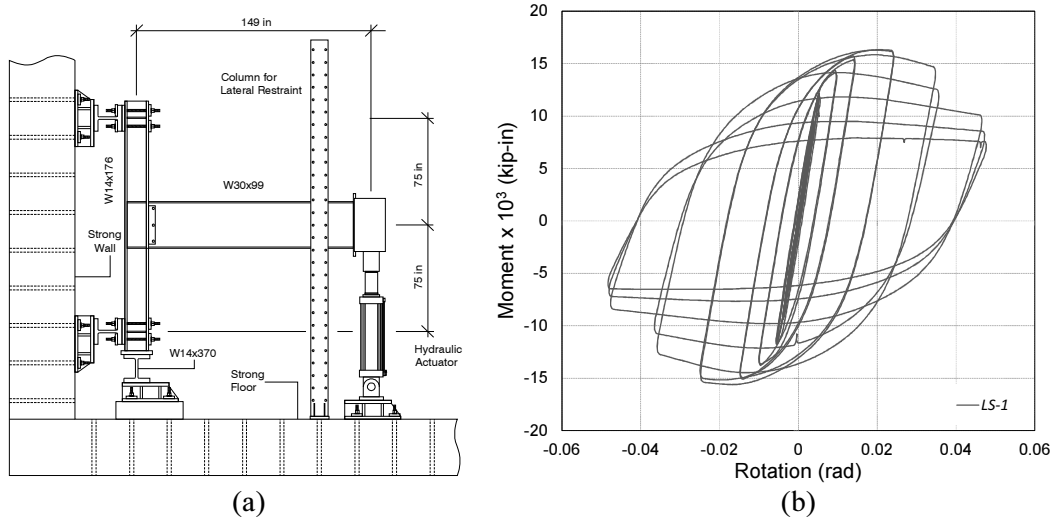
Specimen LS-1: (a) test set-up full-scale steel specimen, (b) moment vs. rotation, after Uang et. al., (2000).
